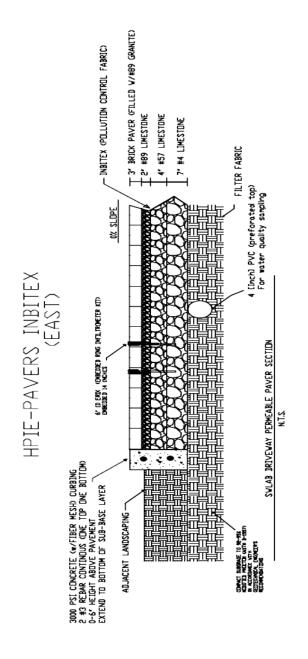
Cross-sectional view of Hanson Pavers Inbitex (HPI)
